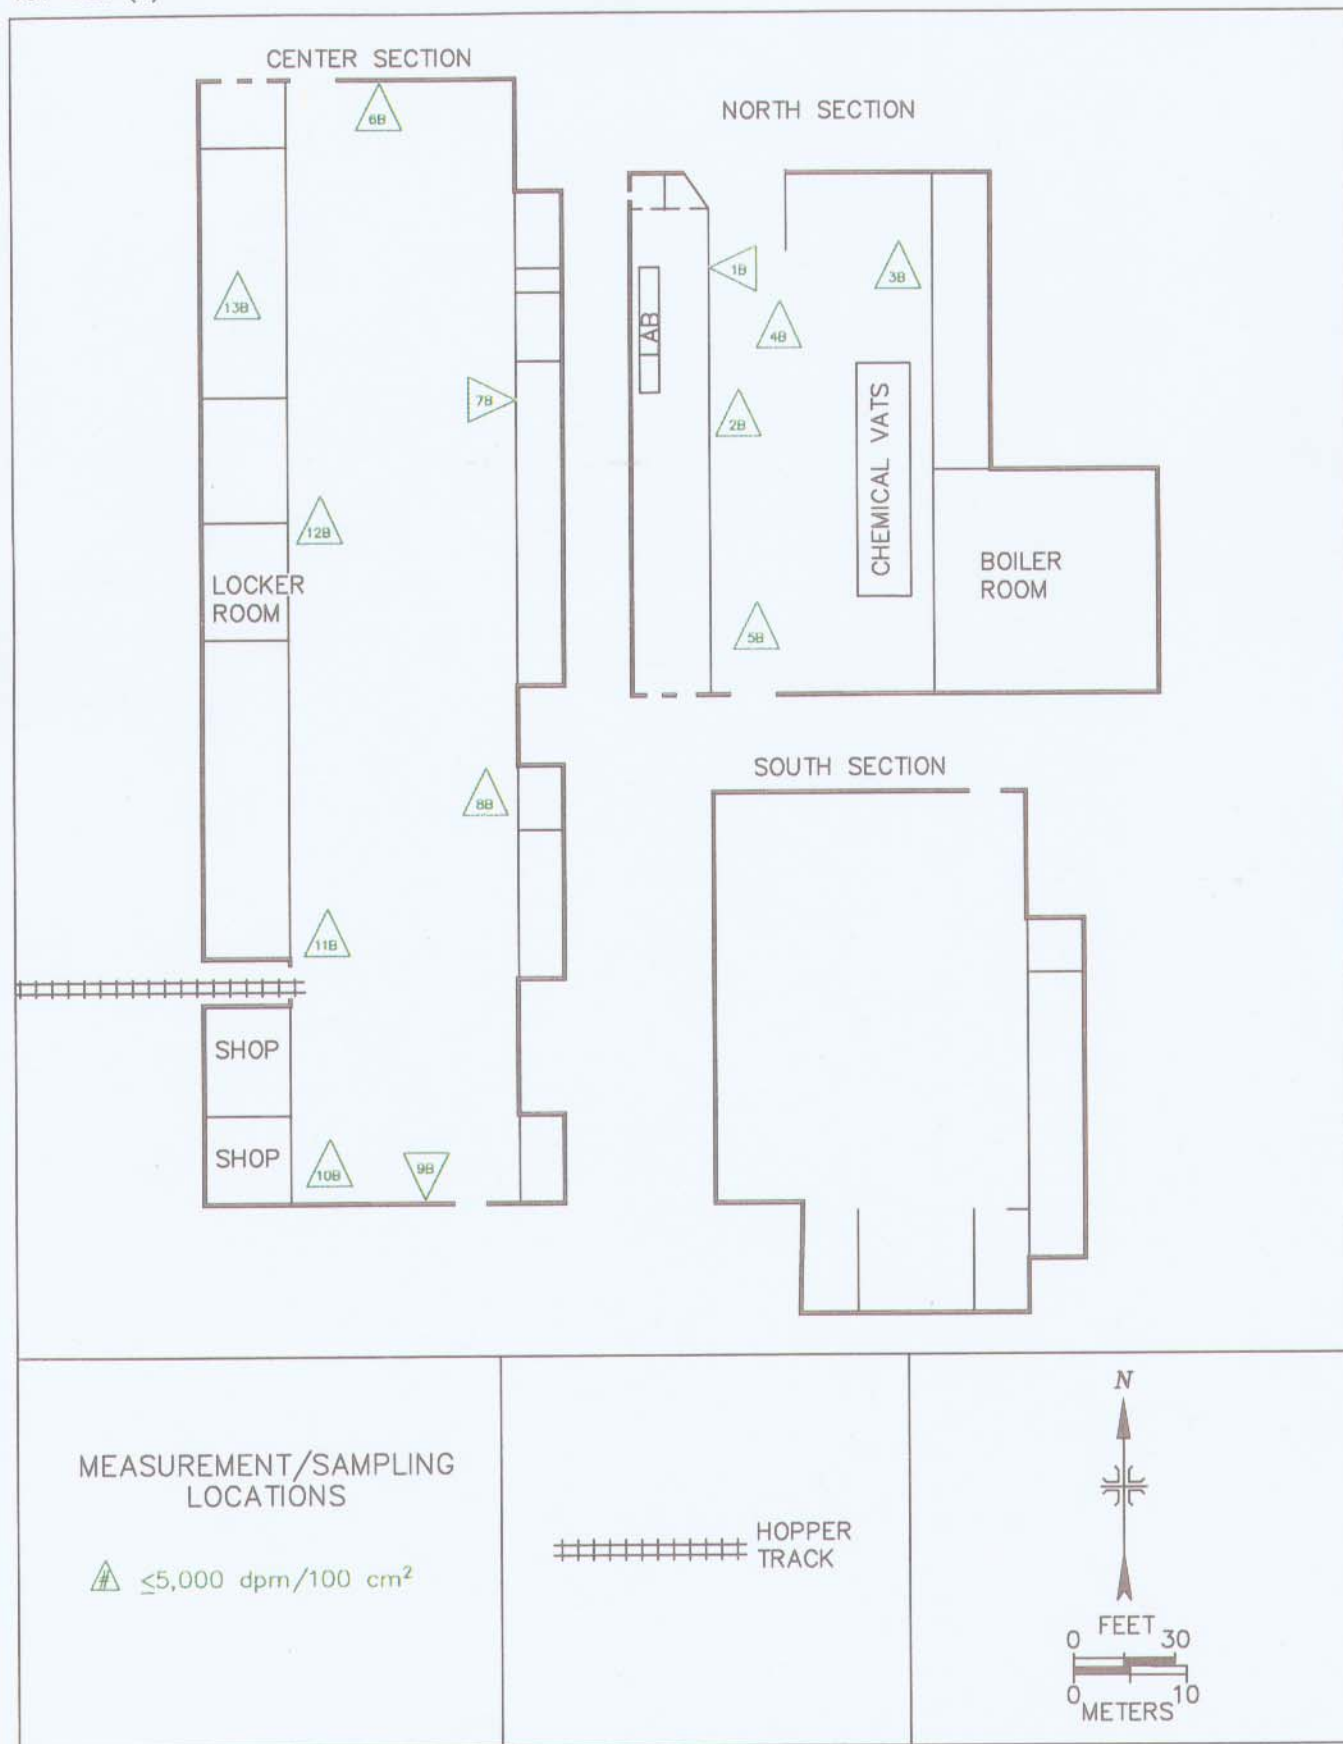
Building 2, Upper Surfaces — Direct Measurement and Sampling Locations
